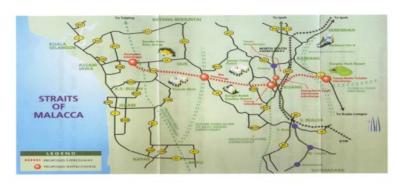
SCHEMATIC LAYOUT PLAN
